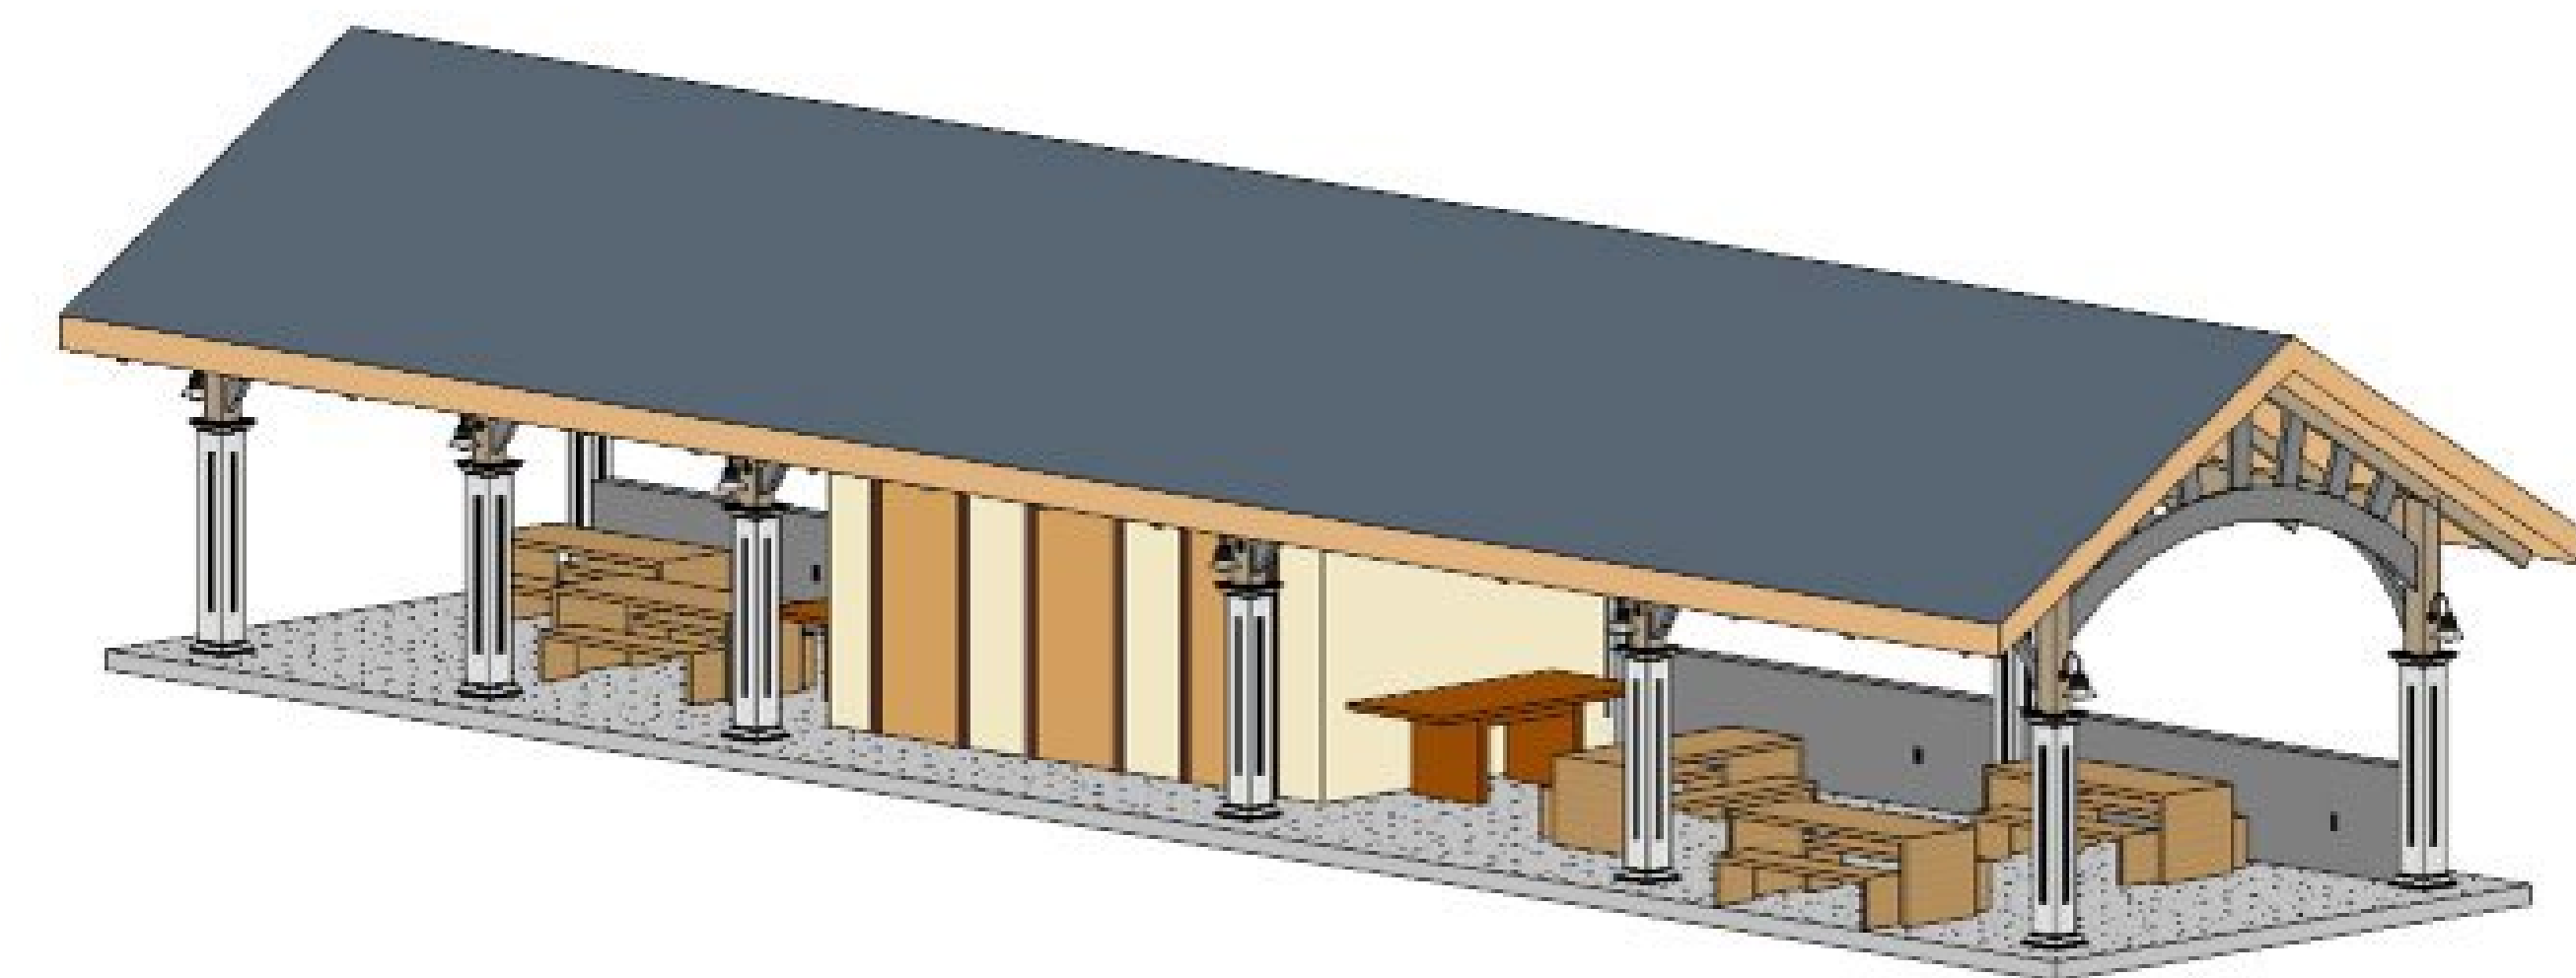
Architectural Render of the Pavilion and Restroom Facility
